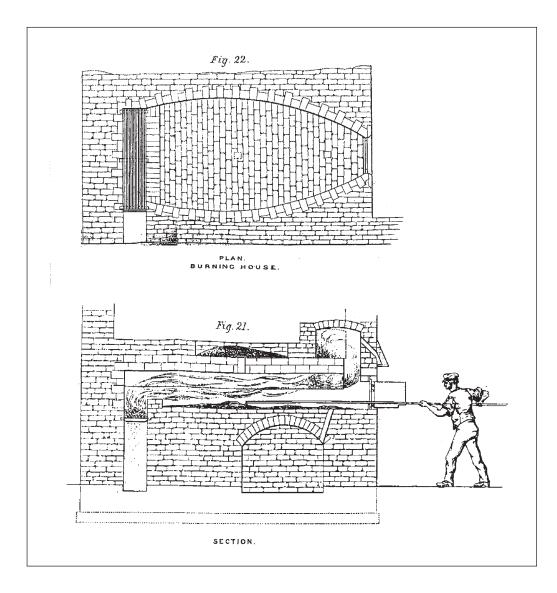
Section drawing and plan showing the interior of a reverberatory calciner or burning house from Henwood* 1832.
